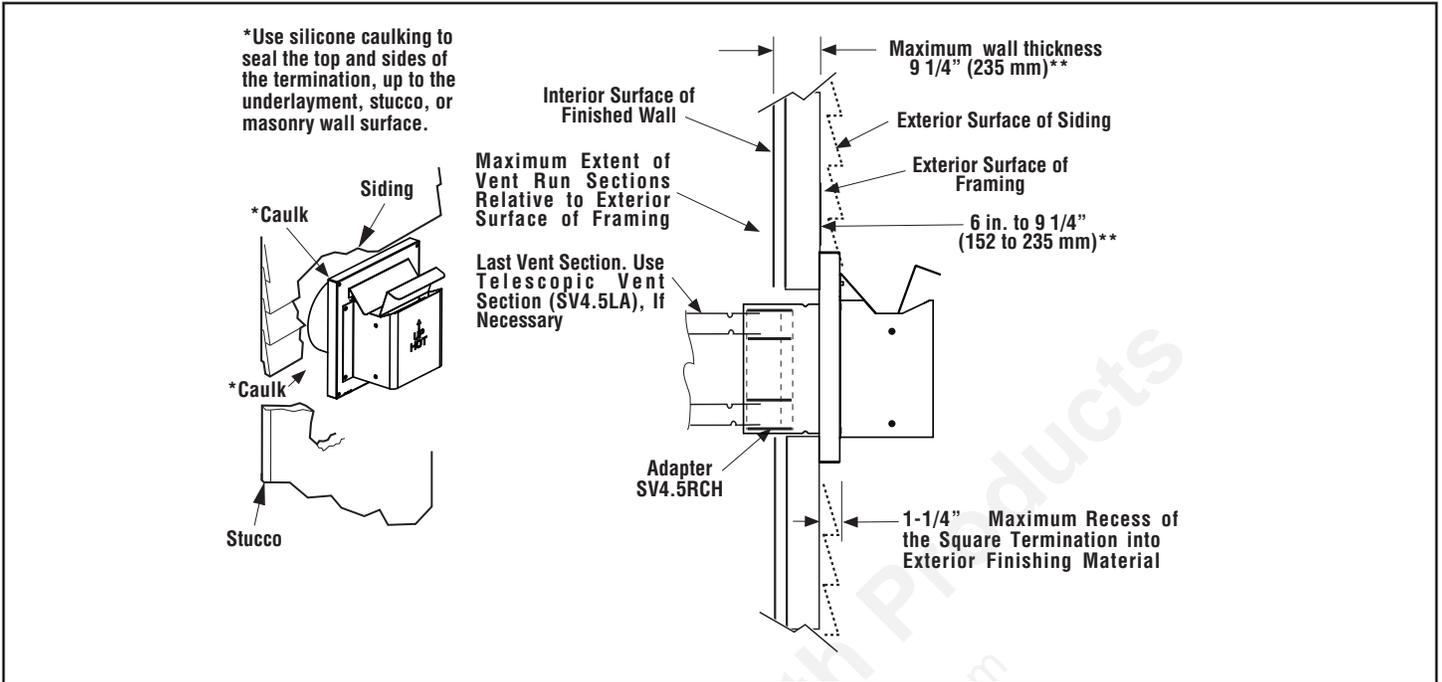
Venting Connection and Exterior Wall Recessing of the Horizontal Compact Termination (SV4.5HTKCT)
